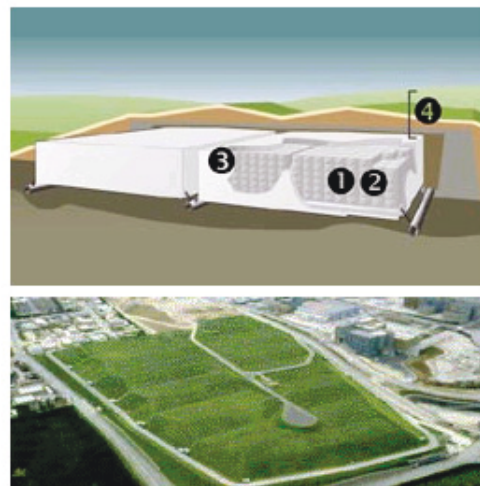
A typical surface disposal facility according to the EU's concept: (1) waste conditioned in concrete; (2) steel container; (3) concrete structure; and (4) several impermeable layers (ONDRAF/NIRAS, 2003)
